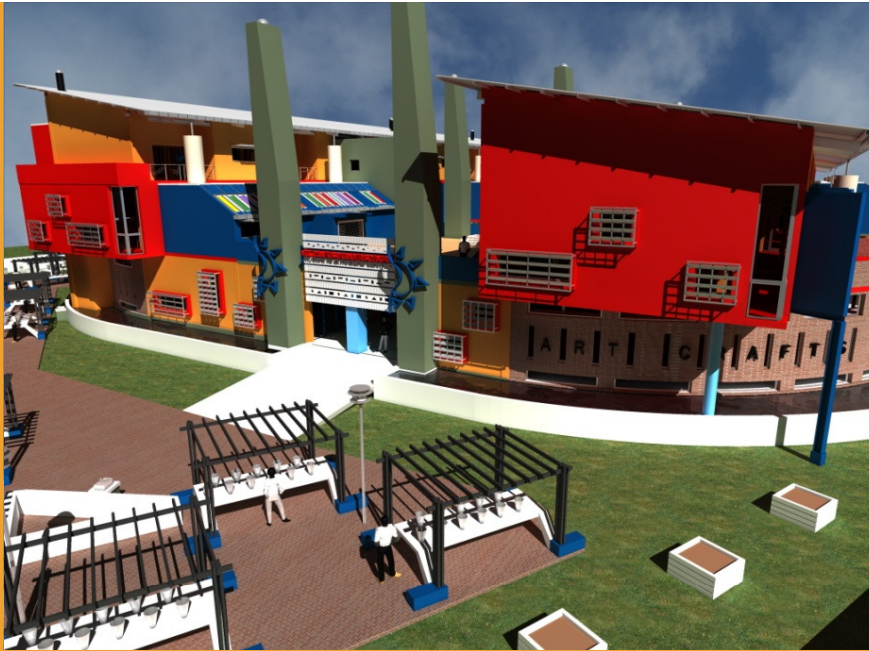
Sketch of building façade at the tourist information centre (Author, 2009).
